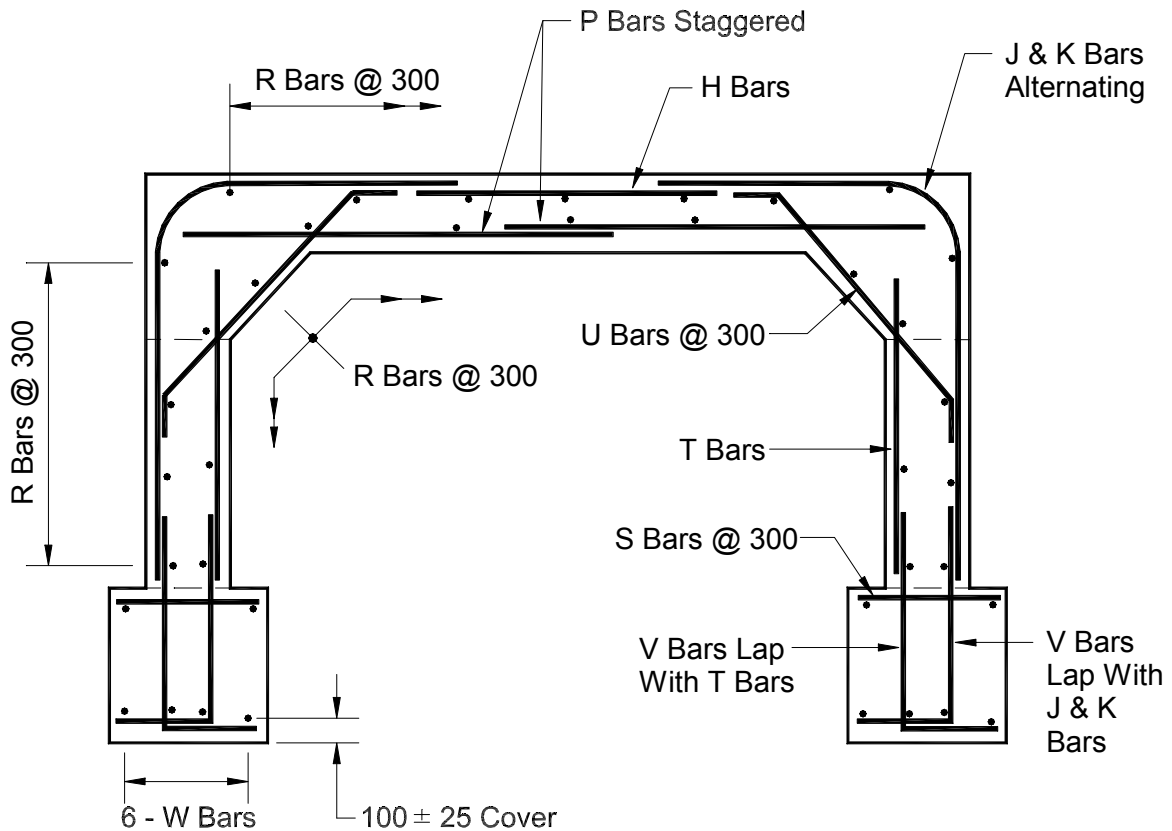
(b) RIGID FRAME OPEN FOOTING CULVERT REINFORCEMENT
